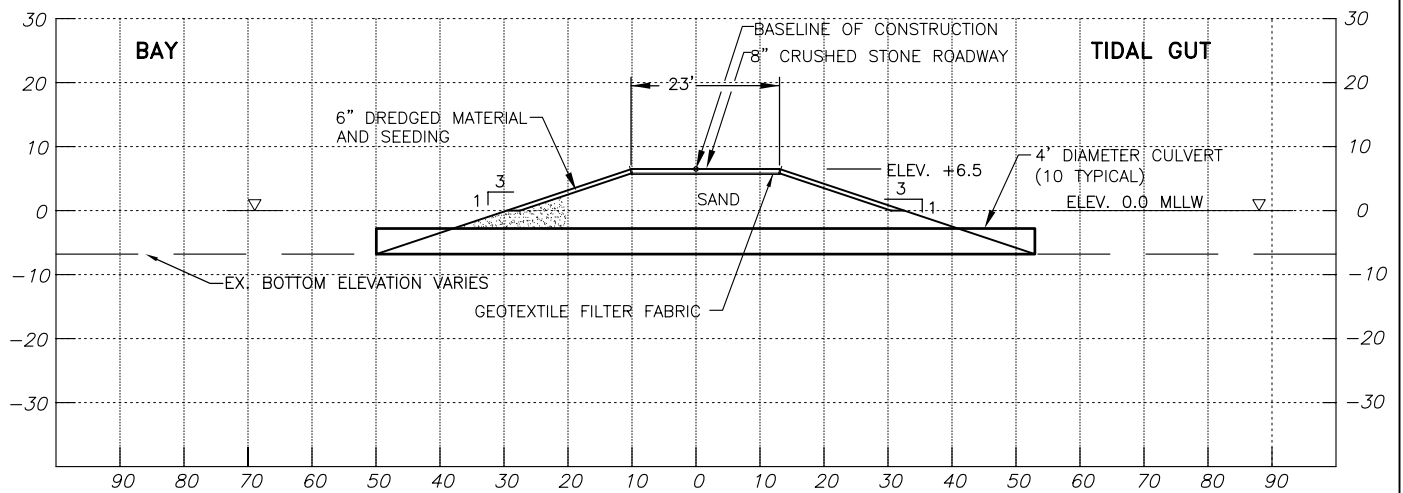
Typical Eastern and Southern Perimeter Dike Sections
